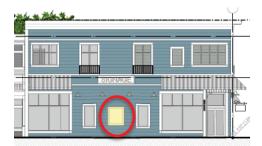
Suggested location for Commemoration Plan, light yellow square set between two small windows, facing Second Avenue
